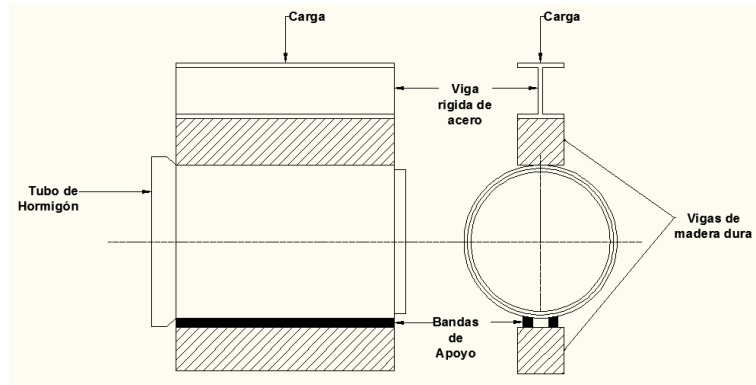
Set up of Three Edge Bearing Test according to ASTM C497
